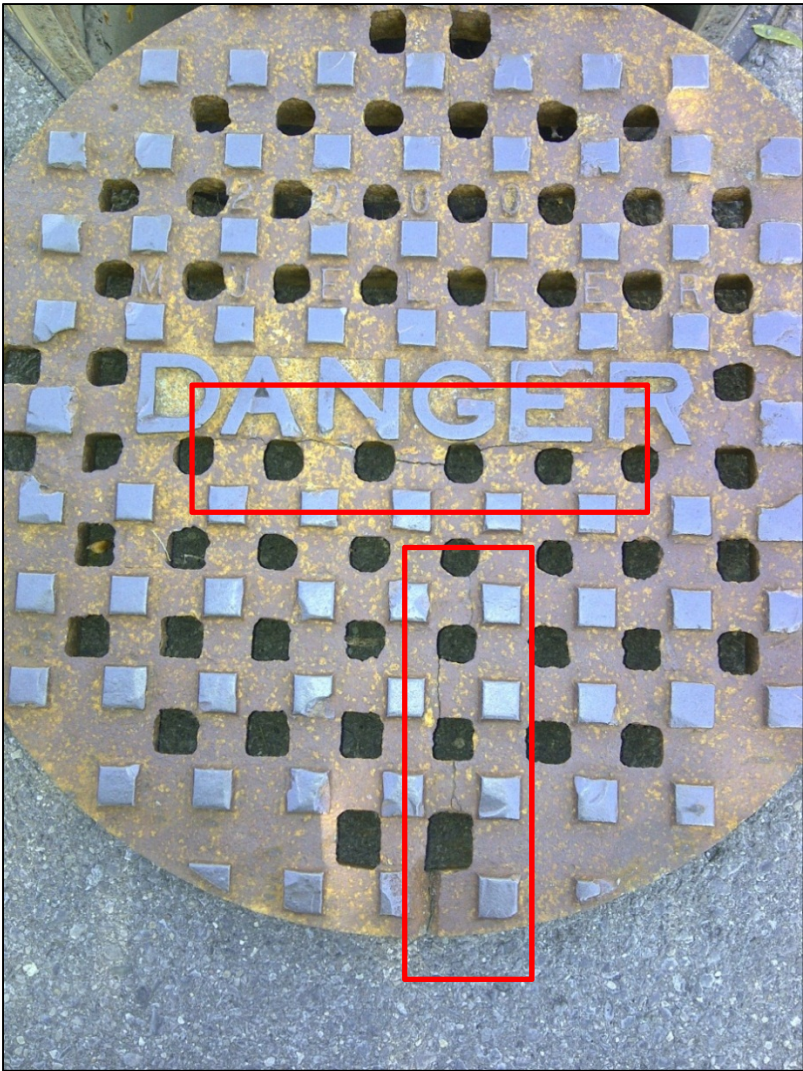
15-102MH5-1 – 1191 Katherine Street – Cracked Manhole Cover
